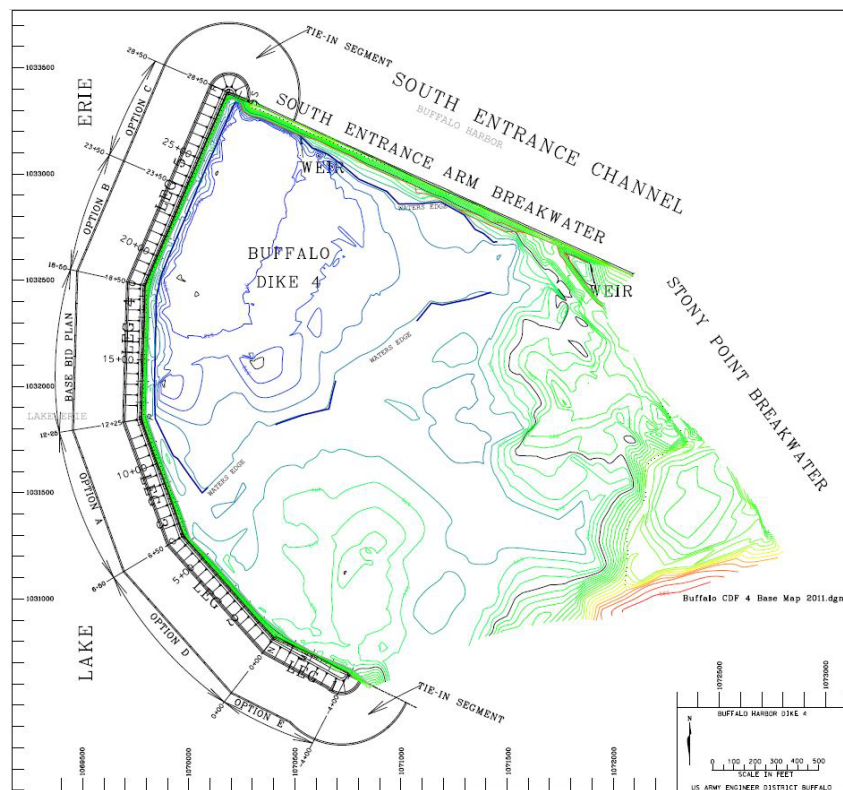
Proposed repair plan-view on existing Perimeter Dike.
